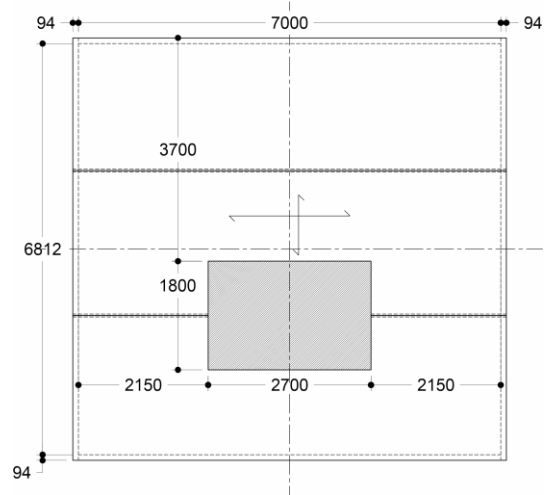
2700 x 1800 mm rectangular stairwell straddling two panels
